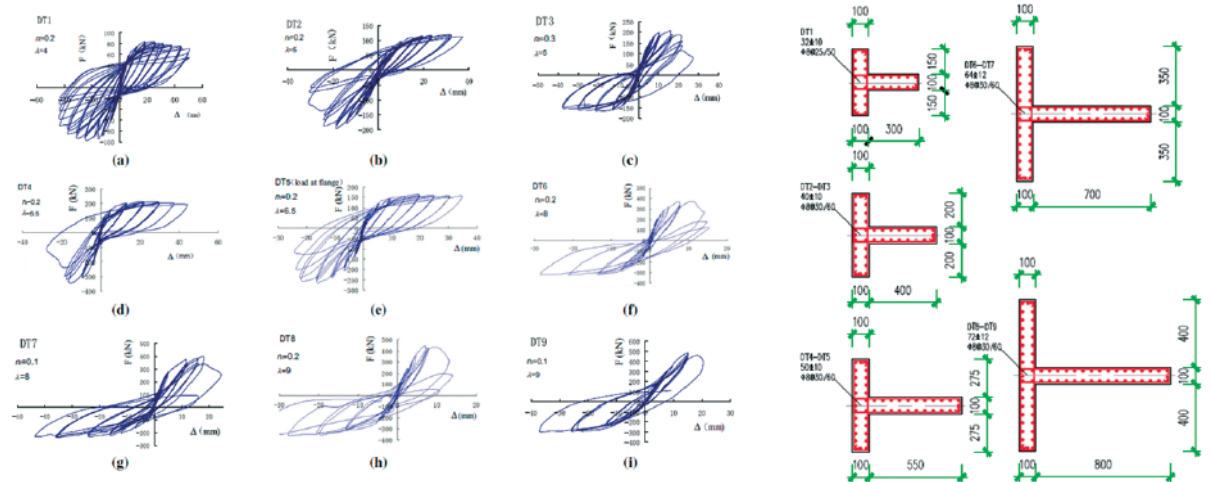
Reinforcement details and hysteric loops of the specimens [7]
